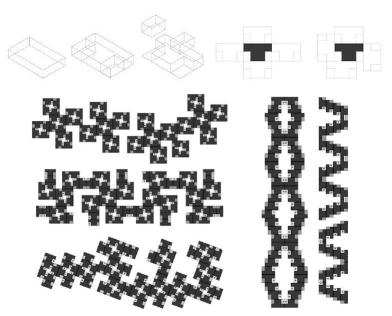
Architectural idea and examples of arrangements. Houses can be connected to each other with any external wall. Examples of house groups (from 50 to100 units). Drawing: Alicja Maciejko.
